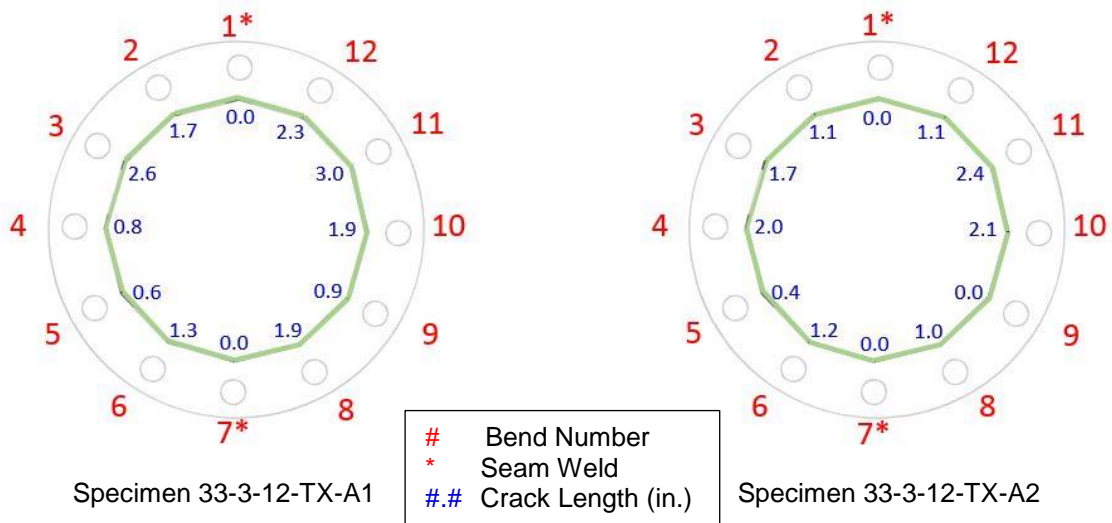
Specimens 33-3-12-TX-A1 and 33-3-12-TX-A2: Cracks after 4.0 Million Fatigue Cycles
